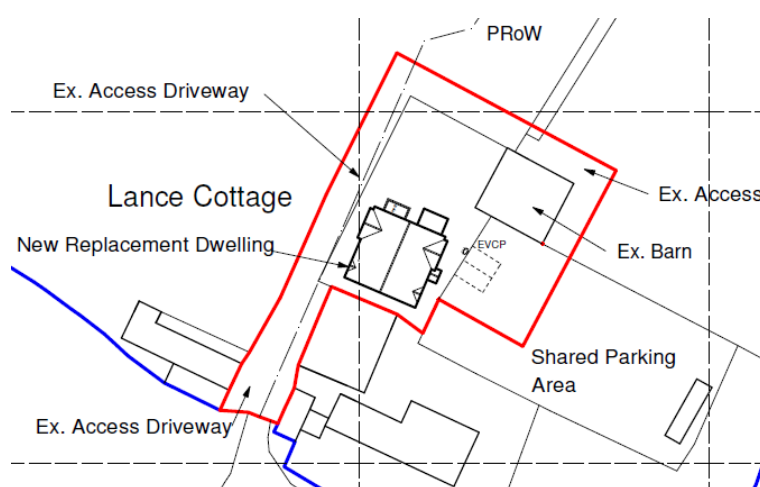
Proposed layout of the replacement dwelling and parking (extract from the Block Plan - drg ref: B12244 06)
